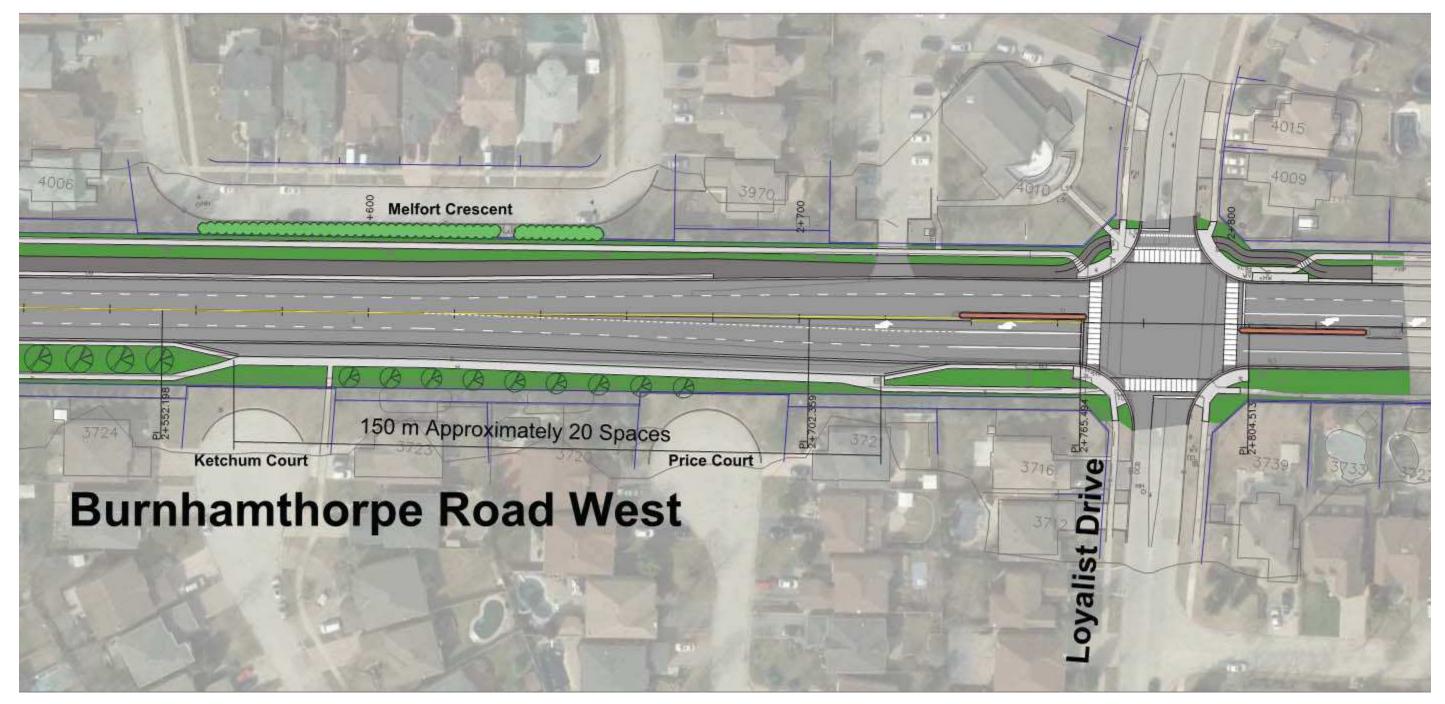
Alternative Design Concept #3 - Widen Burnhamthorpe Road West to 4 Lanes with In-Boulevard Parking on the South Side
